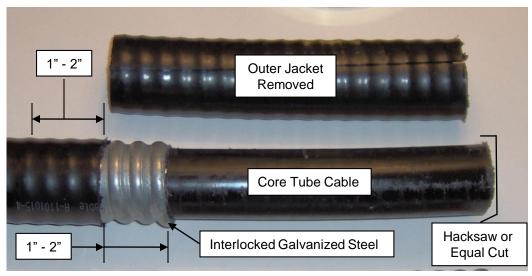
Interlocked Galvanized Steel Tube Cable Outer Jacket and Armor Removed
